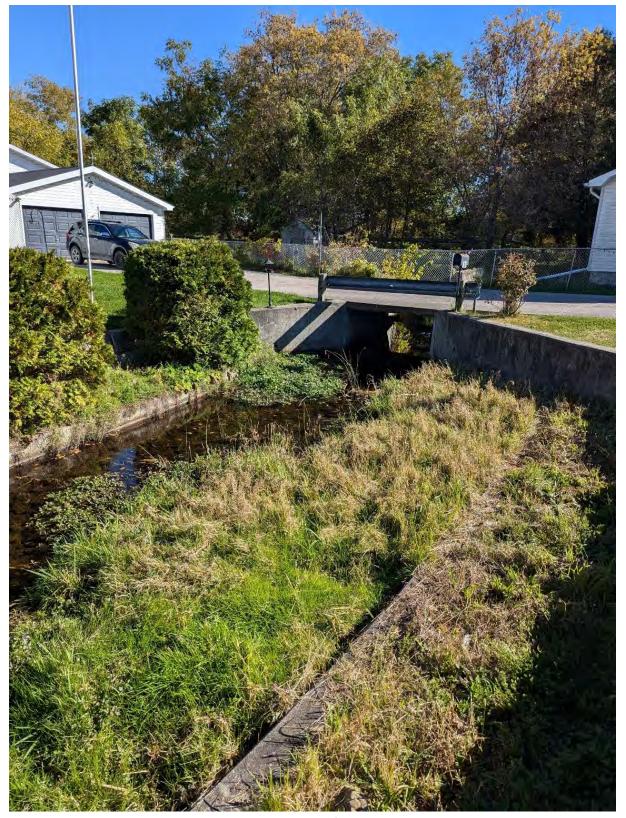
Channel crossing and vegetation within the flood channel adjacent to Park Street
